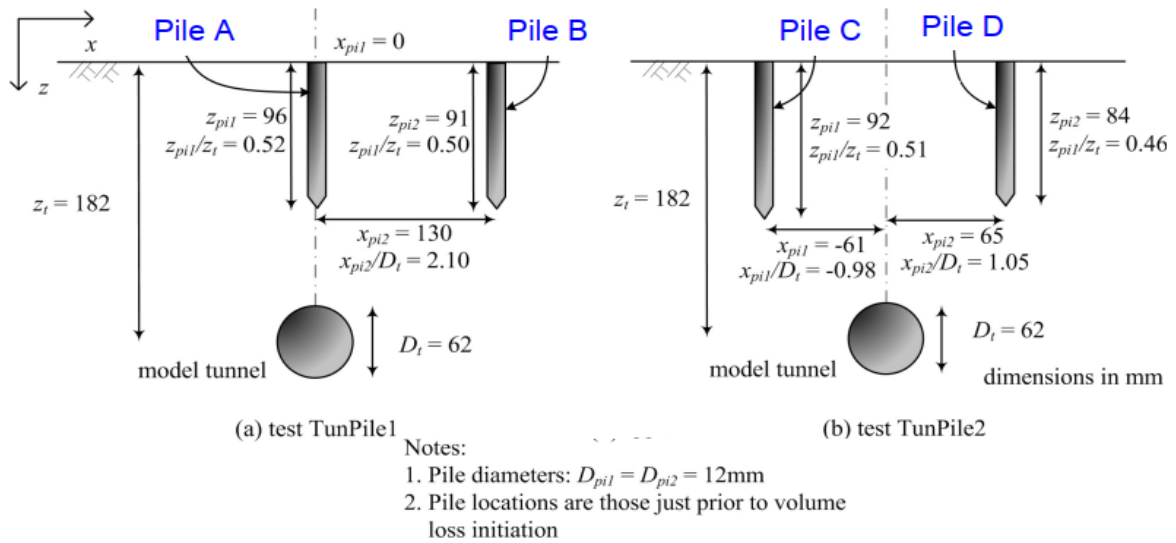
Position of piles in relation to the tunnel (Marshall and Mair, 2011)
